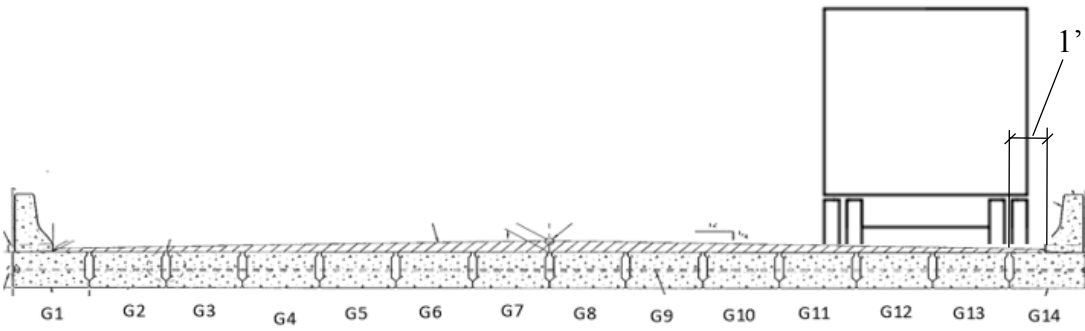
Load Configuration 1 (Single Truck on Exterior Girder/Joint)
